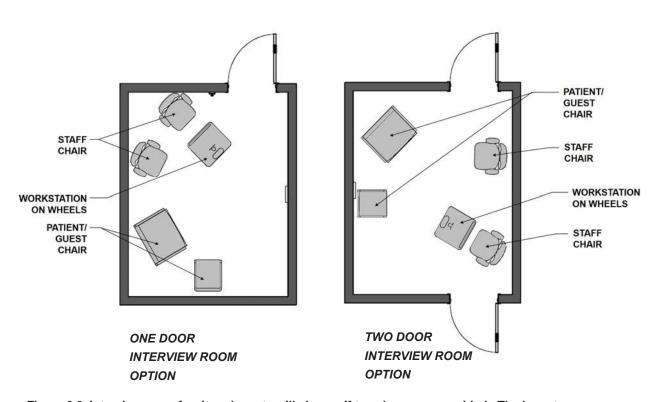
Interview room furniture layouts will change if two doors are provided. The layouts are specifically for improved staff safety.
